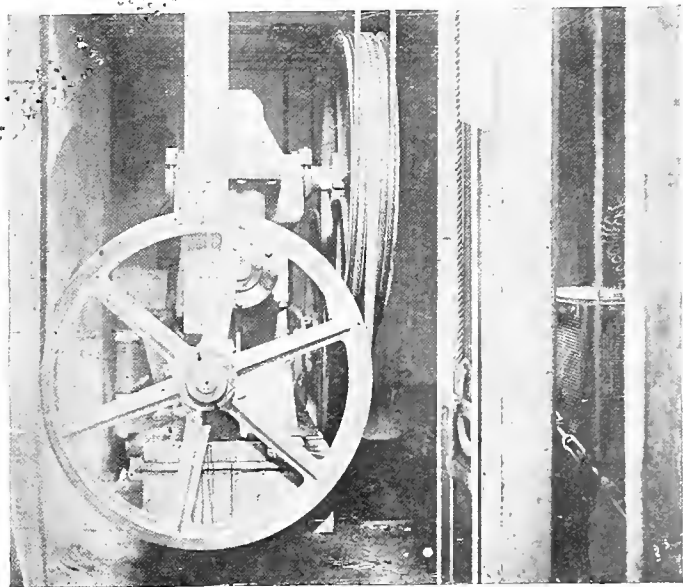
DEPARTURE IN ELECTRIC ELEVATOR CONSTRUCTION.
